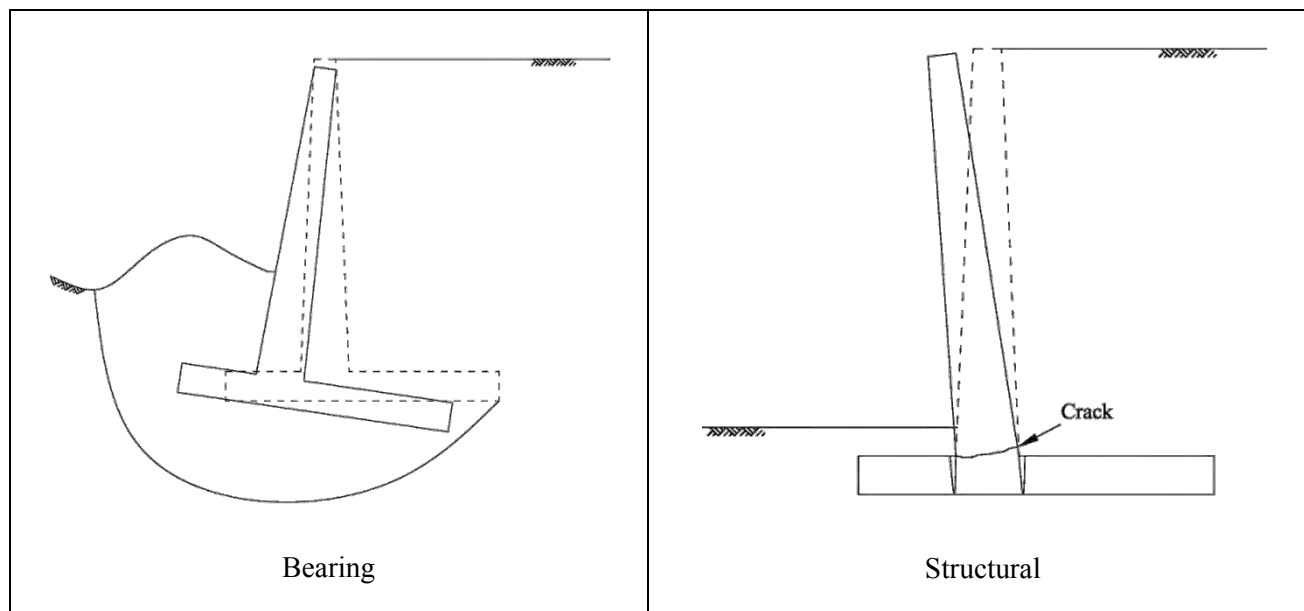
Modes of Failure for a Semi-Gravity Earth Retaining Structure
